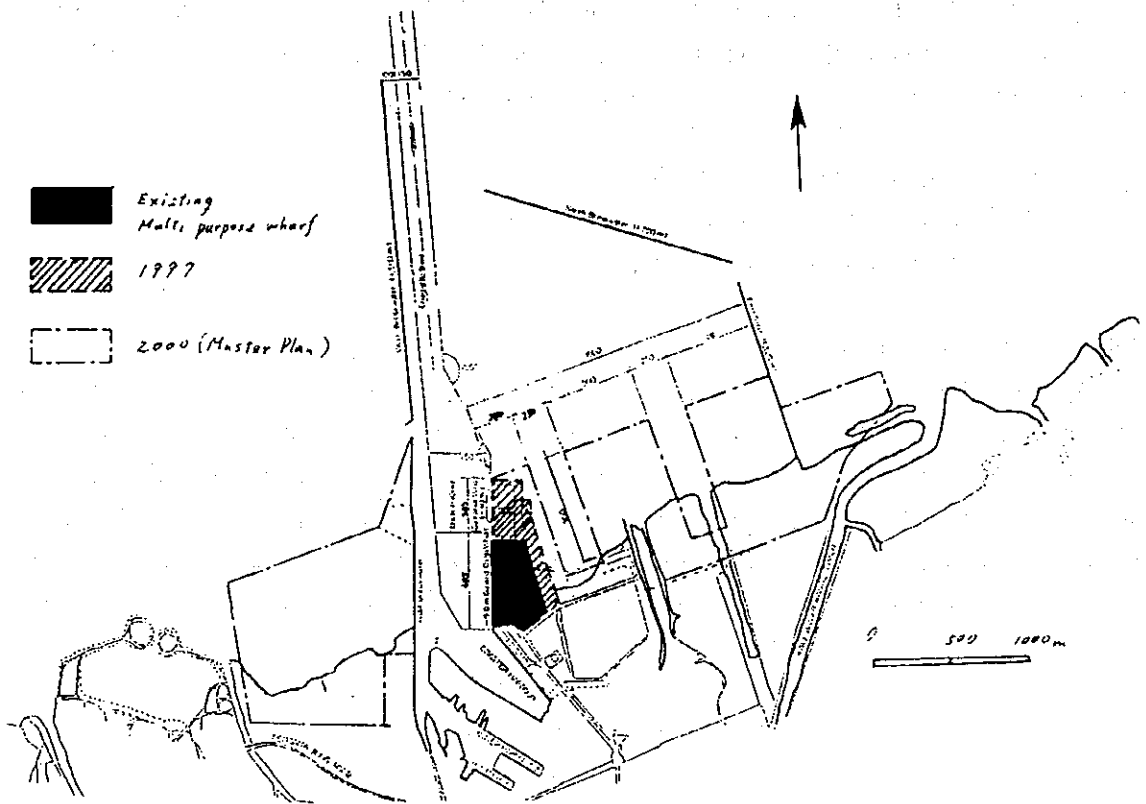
Existing Container Terminal Development Plan (5-1): Tanjung Emas (Semarang)
